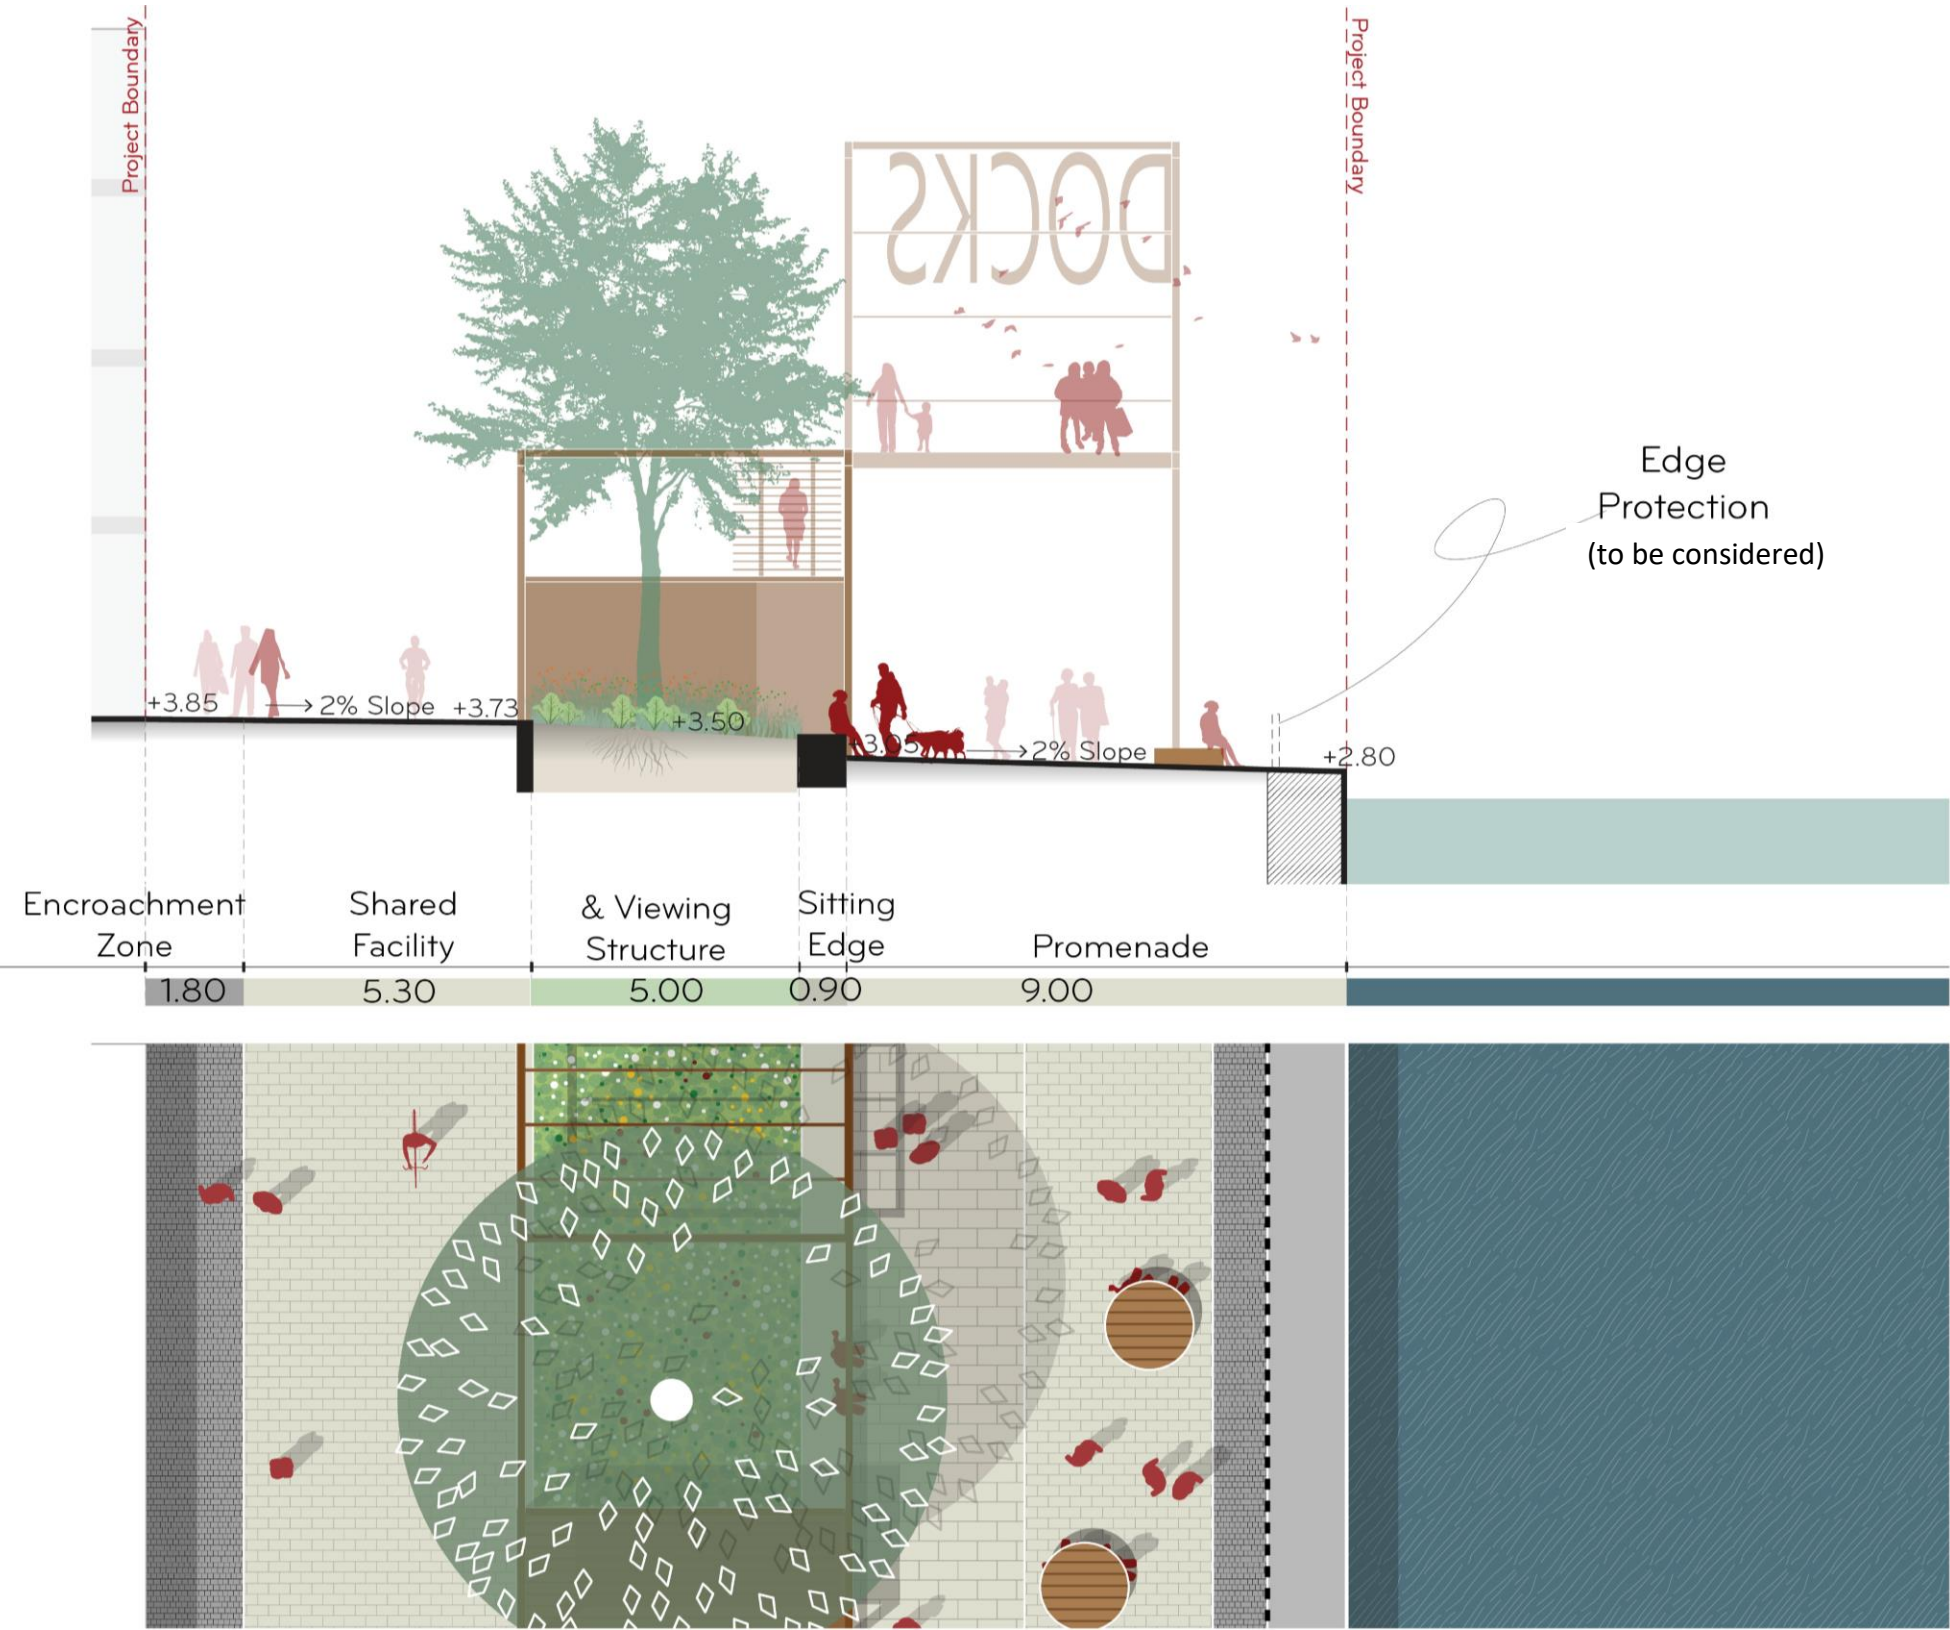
Water Promenade - Section 4 Elevated Dock Viewpoint
